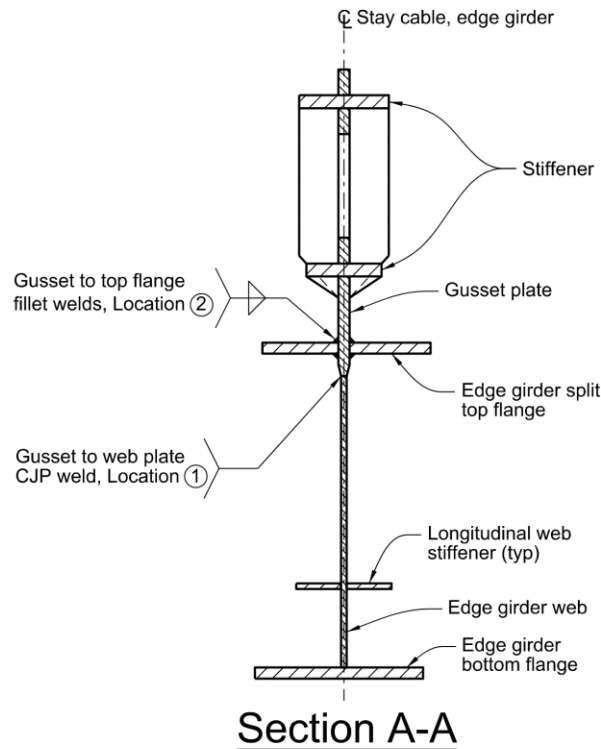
Elevation view of attachment of stay cable anchorage gusset plate to I-shaped steel edge girder.
